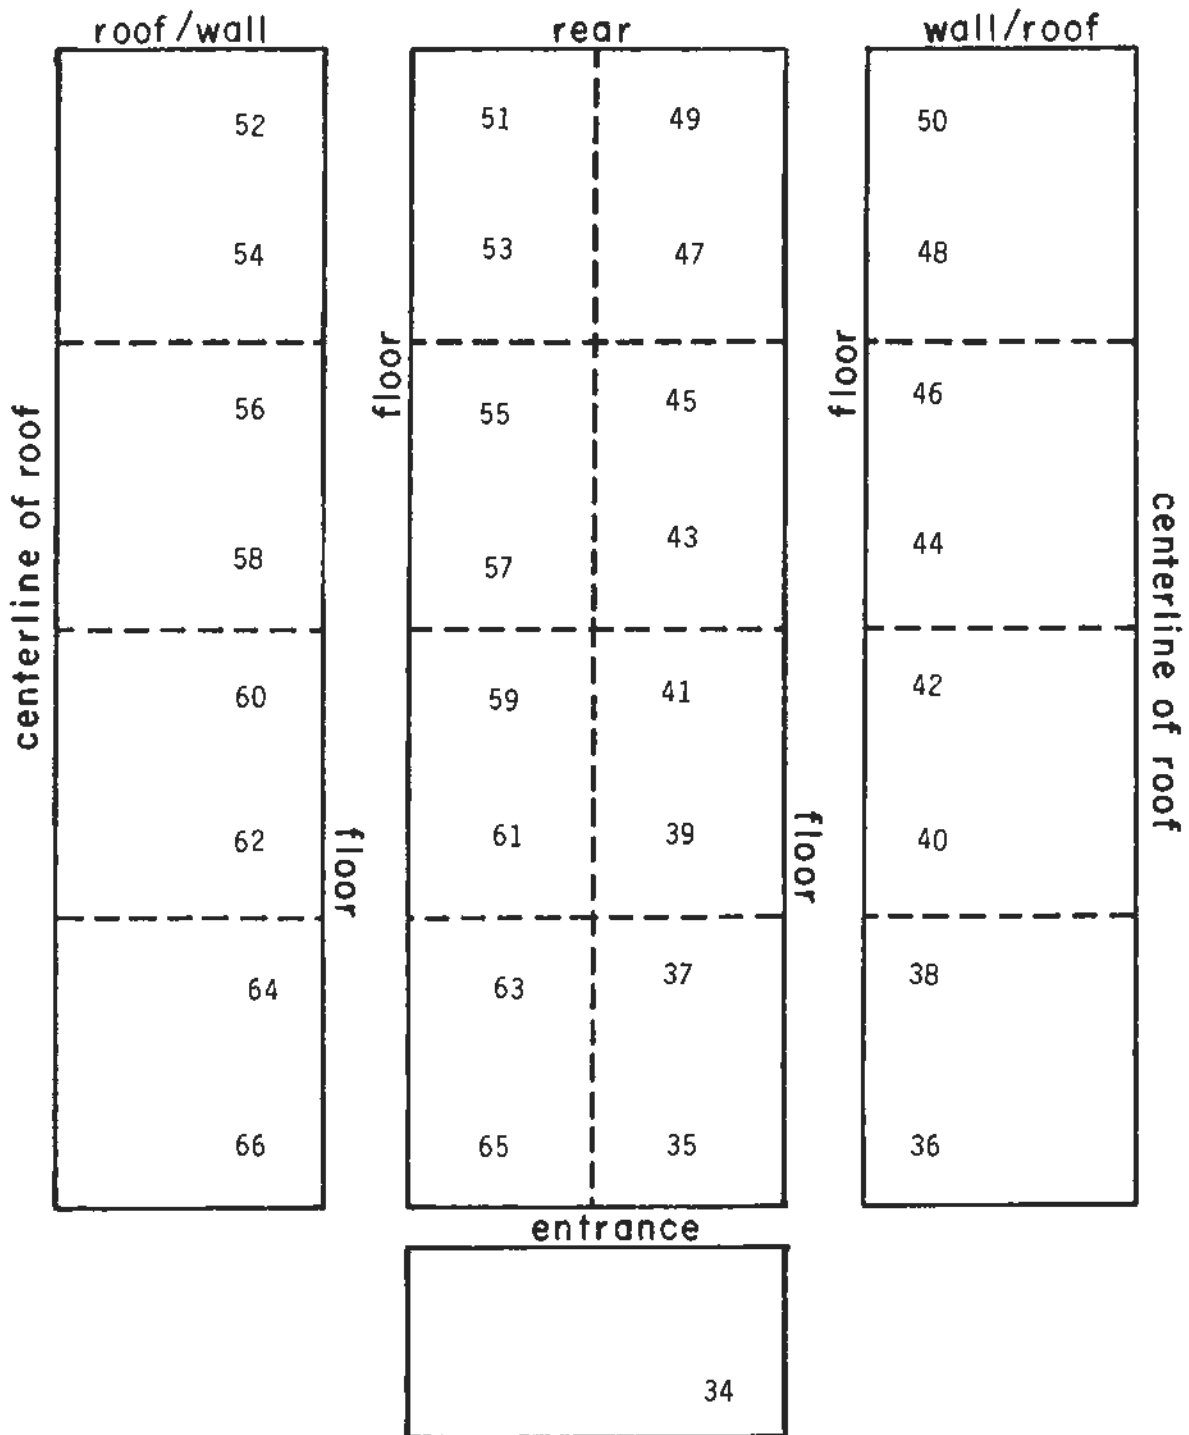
Second Team Surveyed Positions: Building 802 (Interior)
